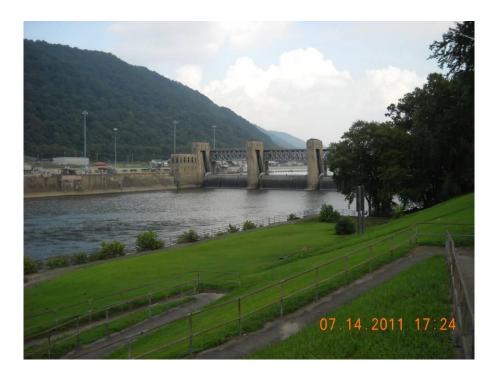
VIEW OF MARMET DEVELOPMENT FROM CONCRETE ACCESS RAMP AT BILL WELLS COMMUNITY PARK.
